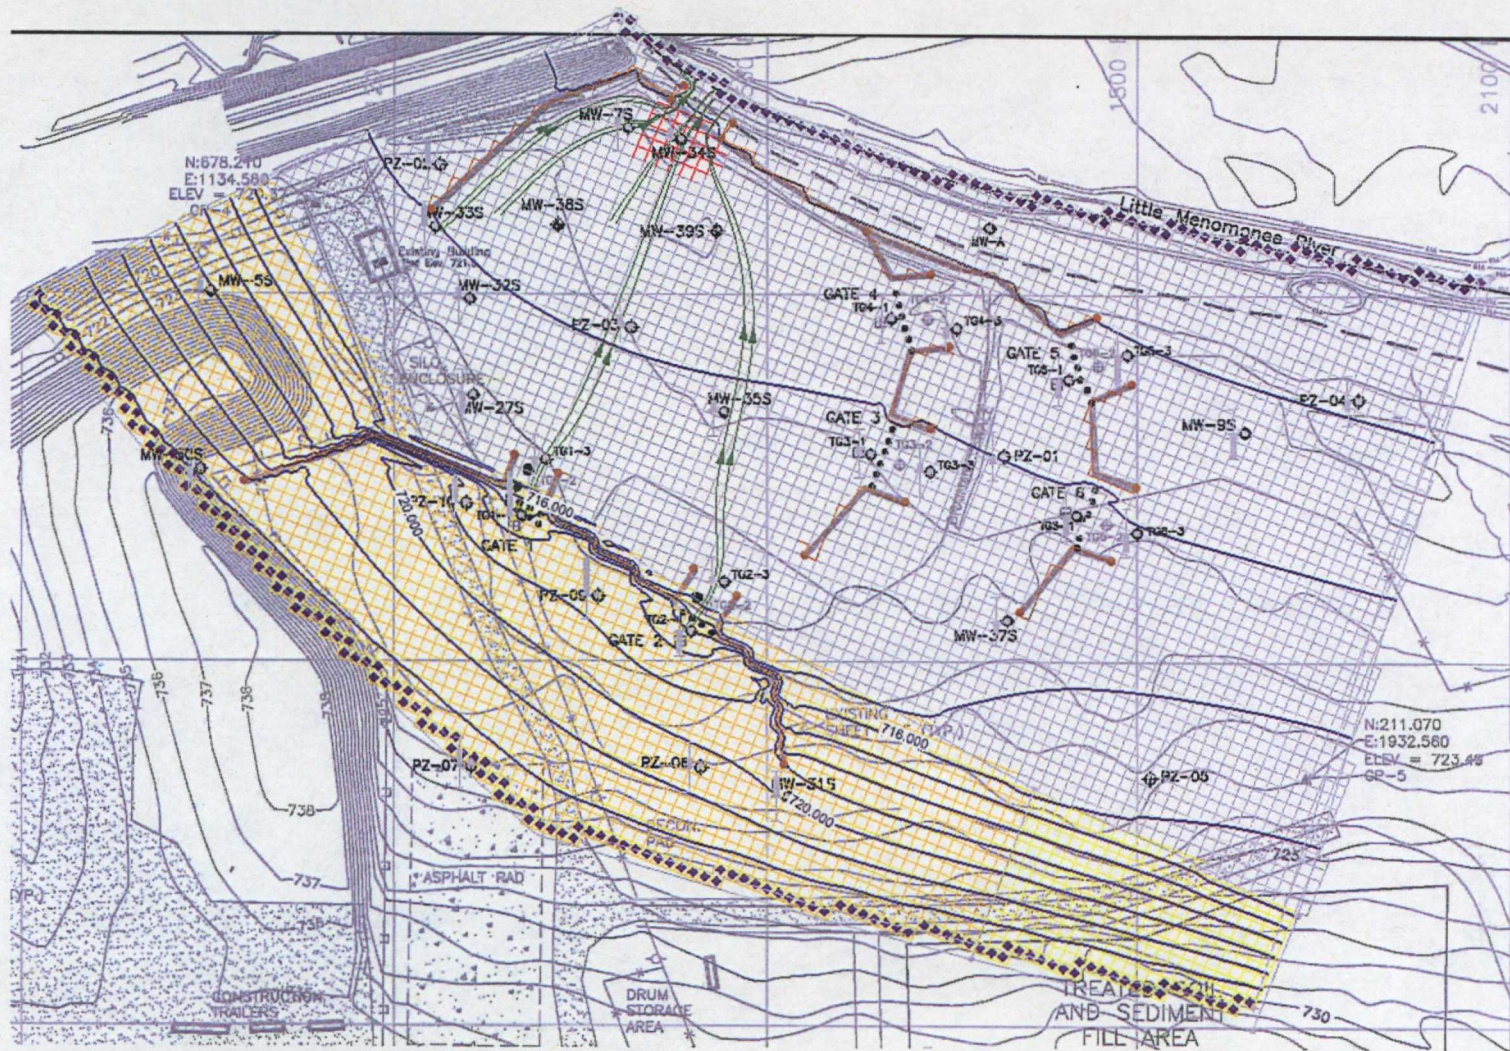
New Gate North of MW-34S, Excavation at MW-34S
